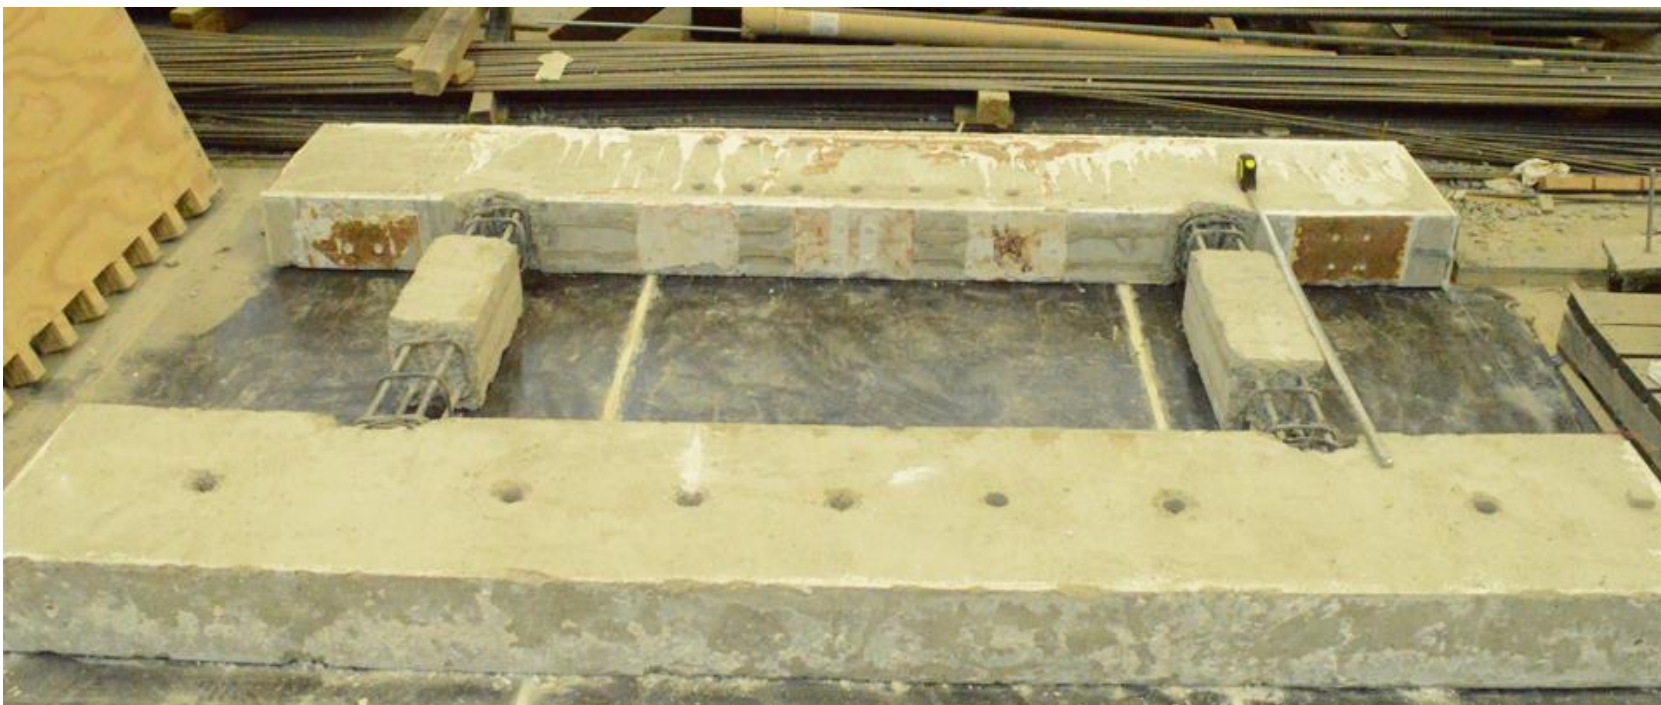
Recast Frame 2 on Formwork with Column Concrete Removed
